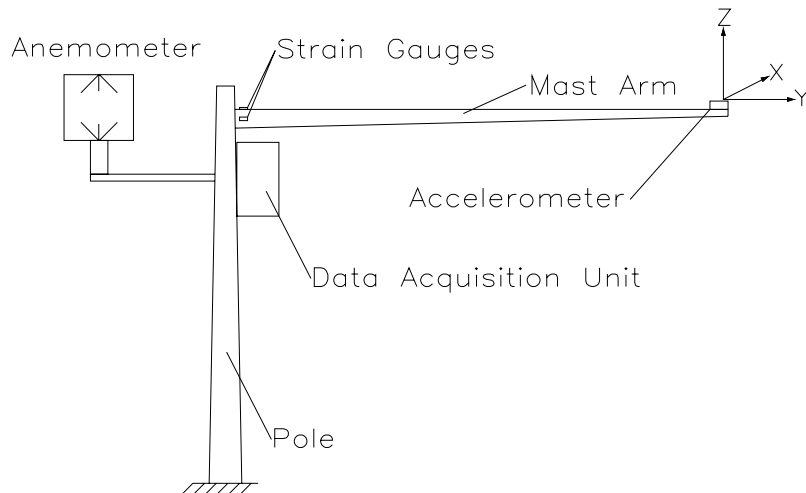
Elevation view of equipment layout on typical traffic signal structure (axes shown correspond to accelerometer data)
